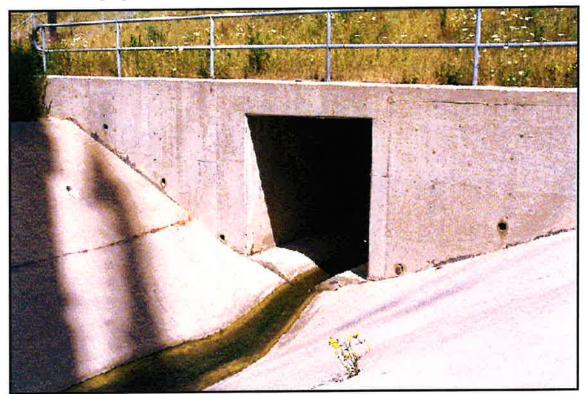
View of the downstream face and transition of the Freeman Pond outlet culvert.
